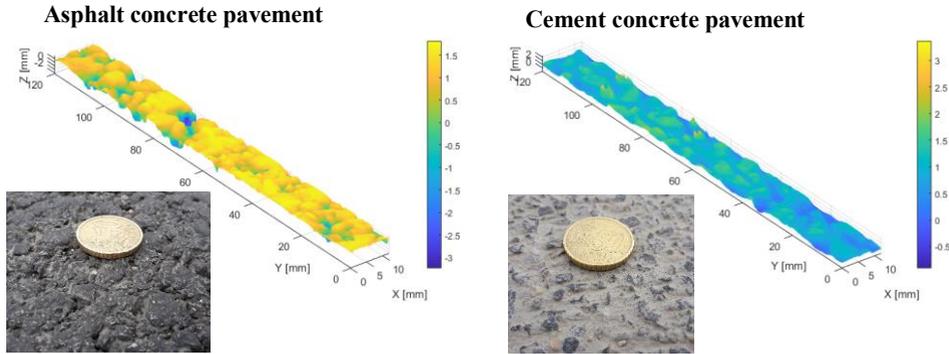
3D pavement scans of Asphalt / Concrete pavement.
